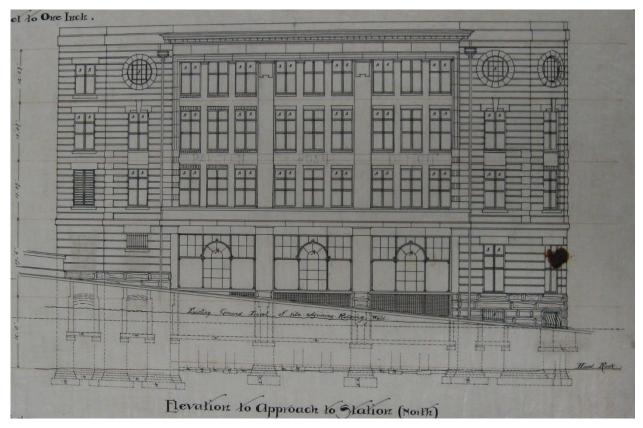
New Parcels Post Office Premises at the Central Railway Station Sydney: Elevation to Devonshire Street Subway (north), 1910.
